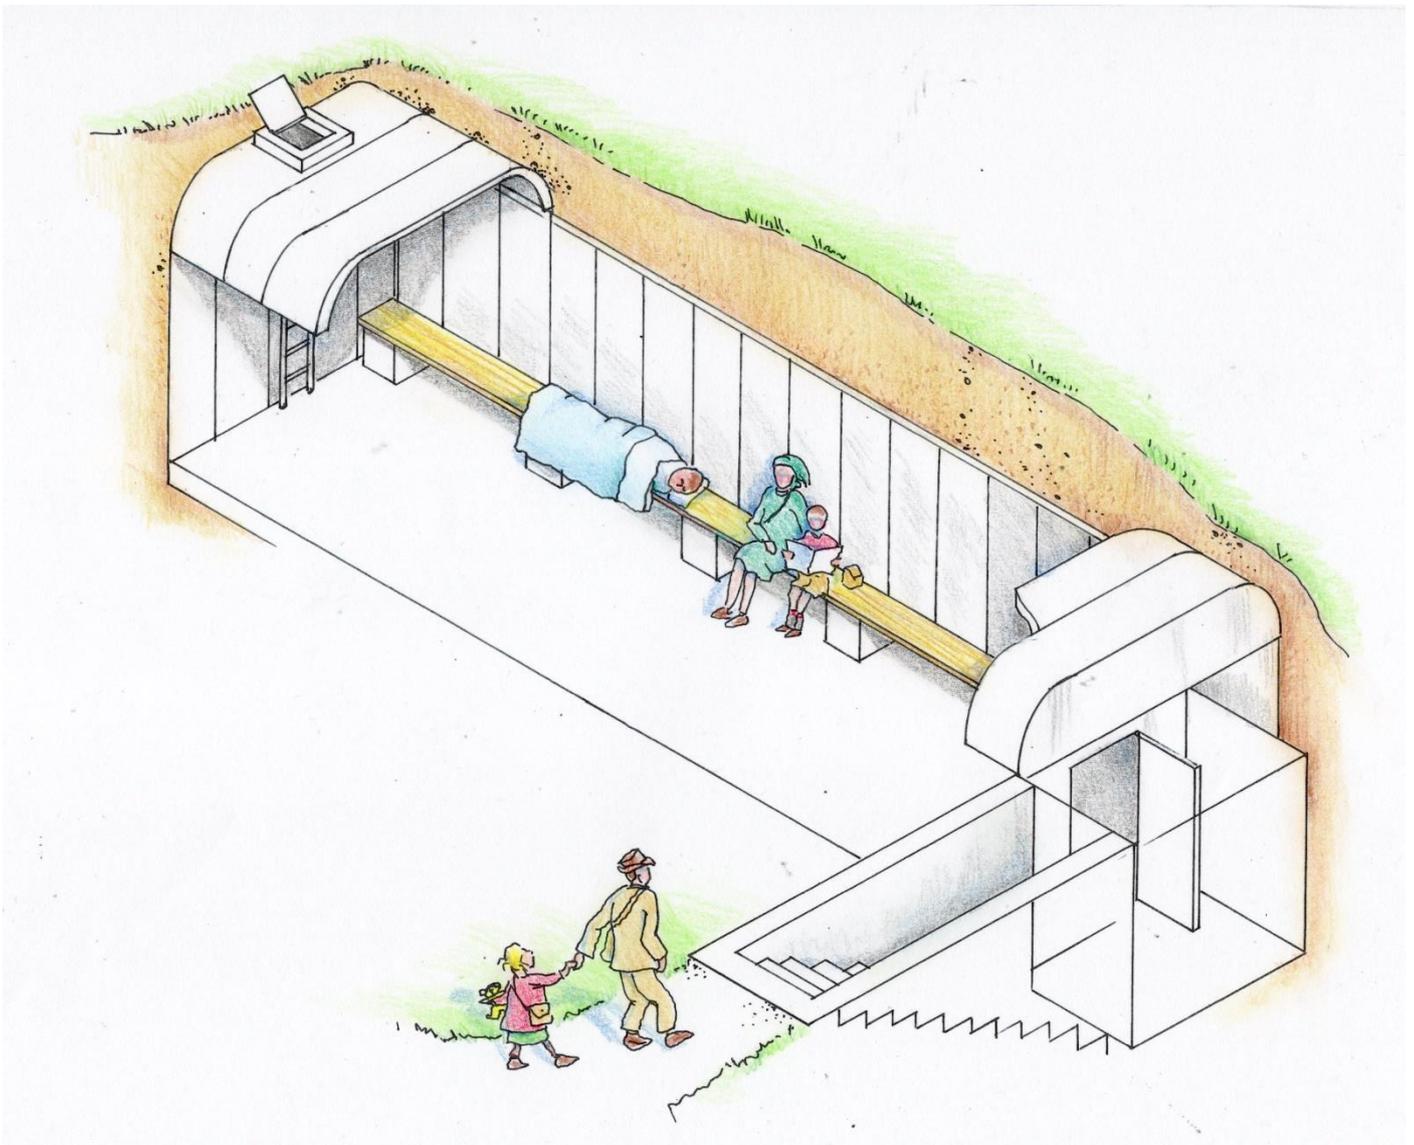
Isometric Cutaway Reconstruction of the Air Raid Shelter by Neil Pinchbeck
